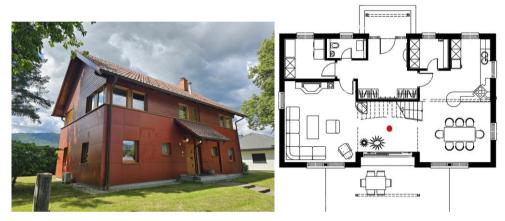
Older house Bellevue (left) and its ground floor plan (right, a measuring position marked with a red mark)
